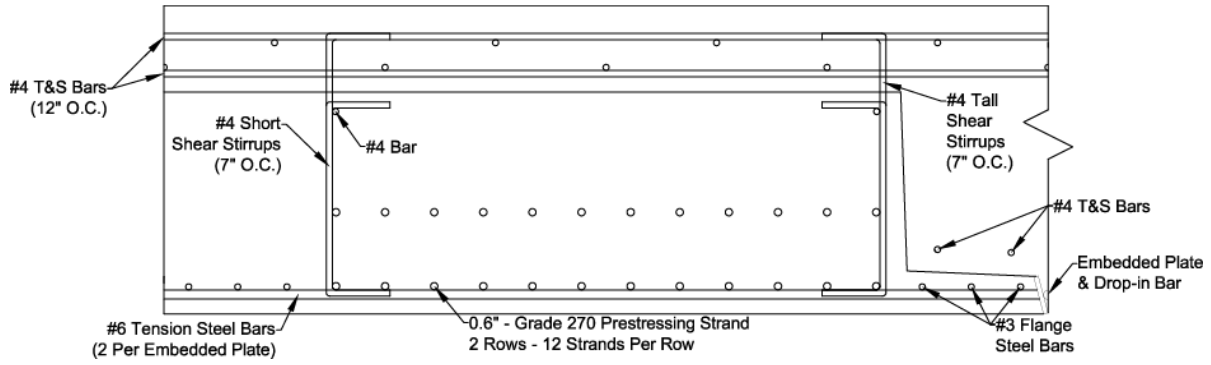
Embedded Plate Inverted-T Shaped Test Section
